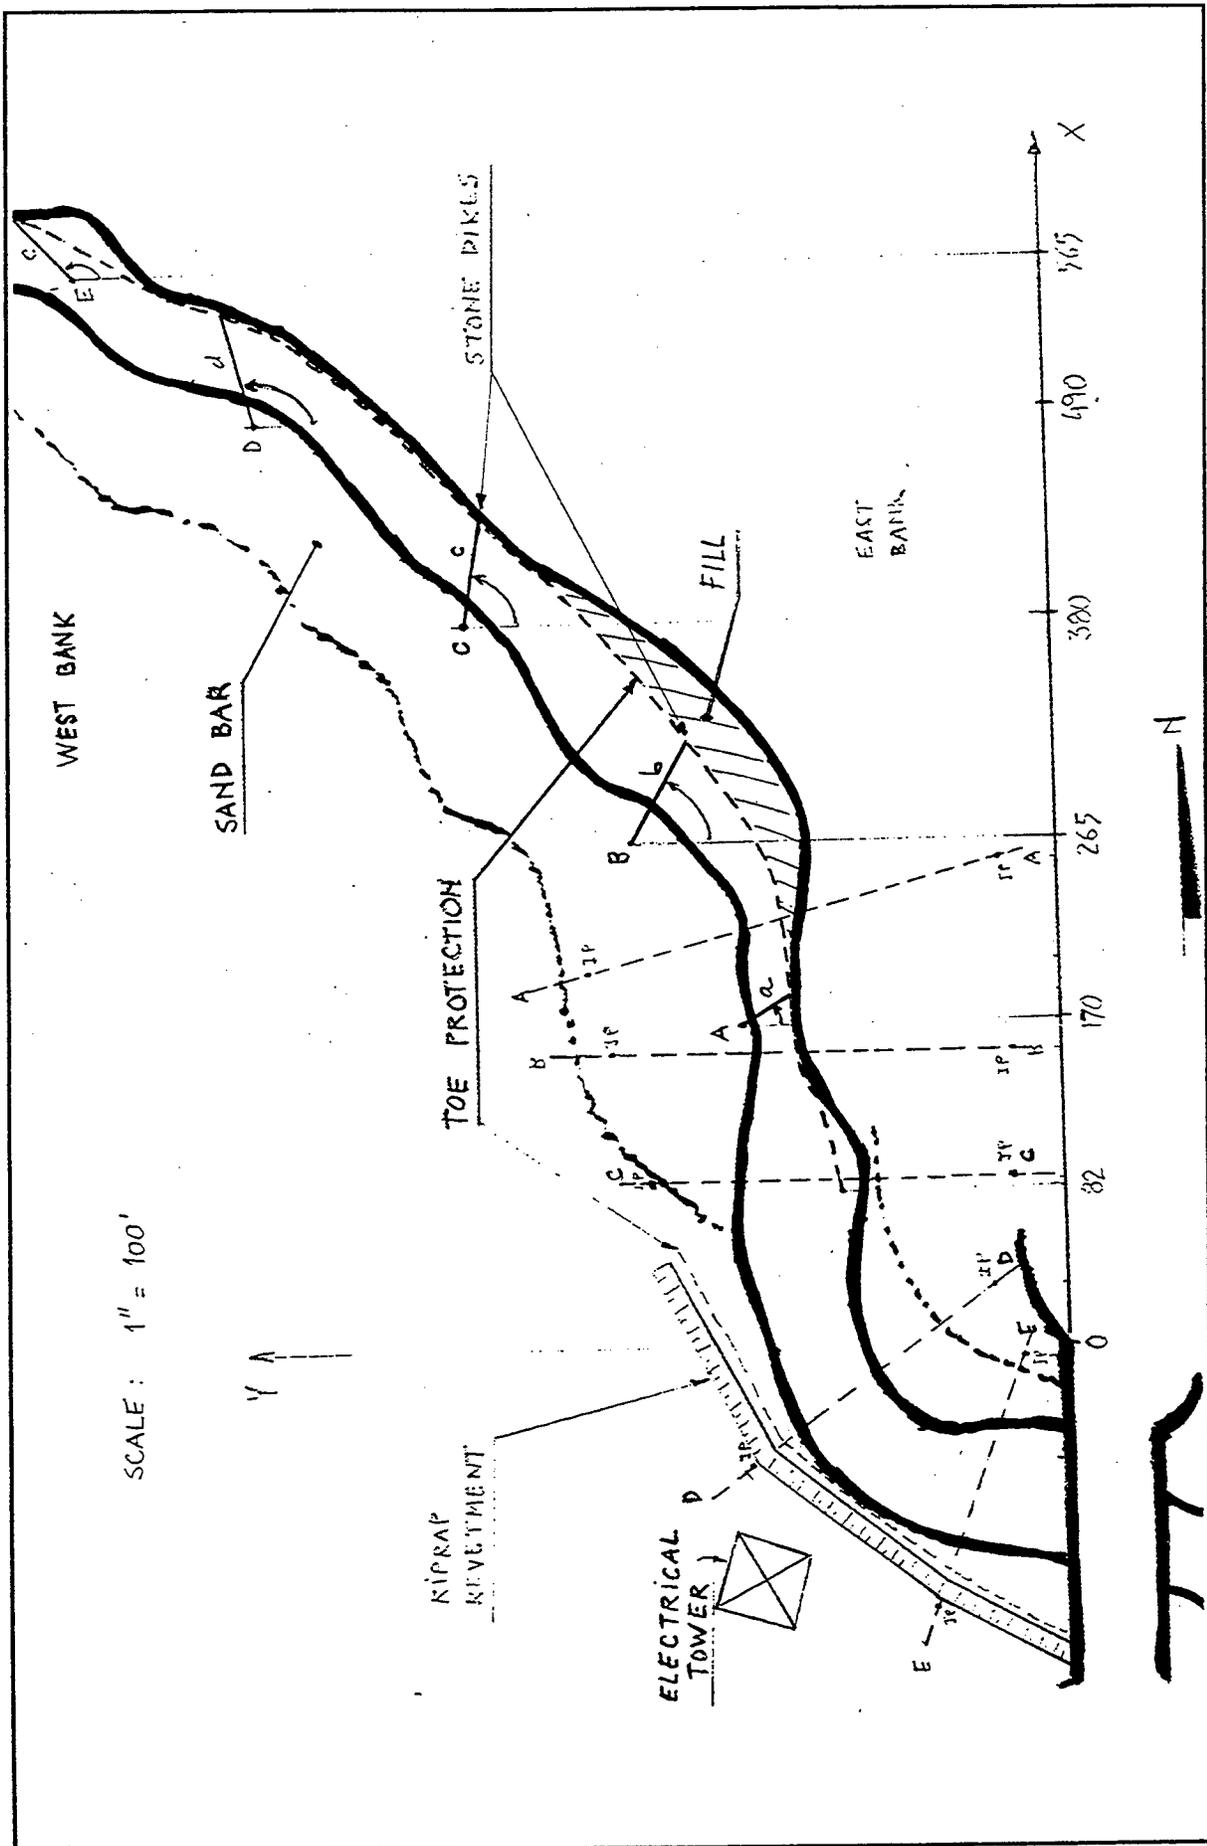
Senachwine Creek alternative 1 design overview (aerial photo trace - 1994).
